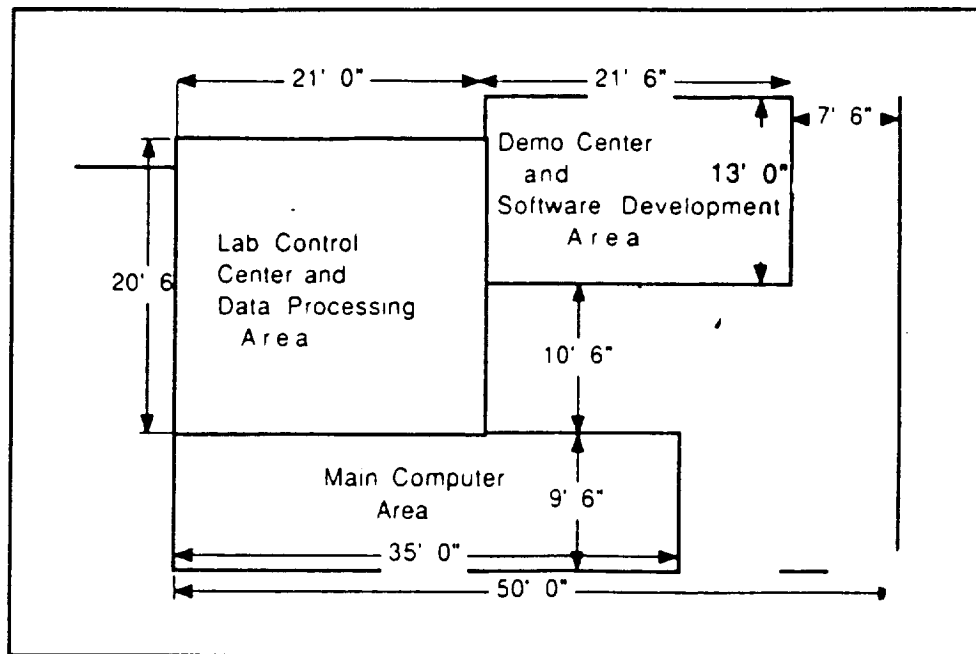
MEZZANINE LAYOUT
